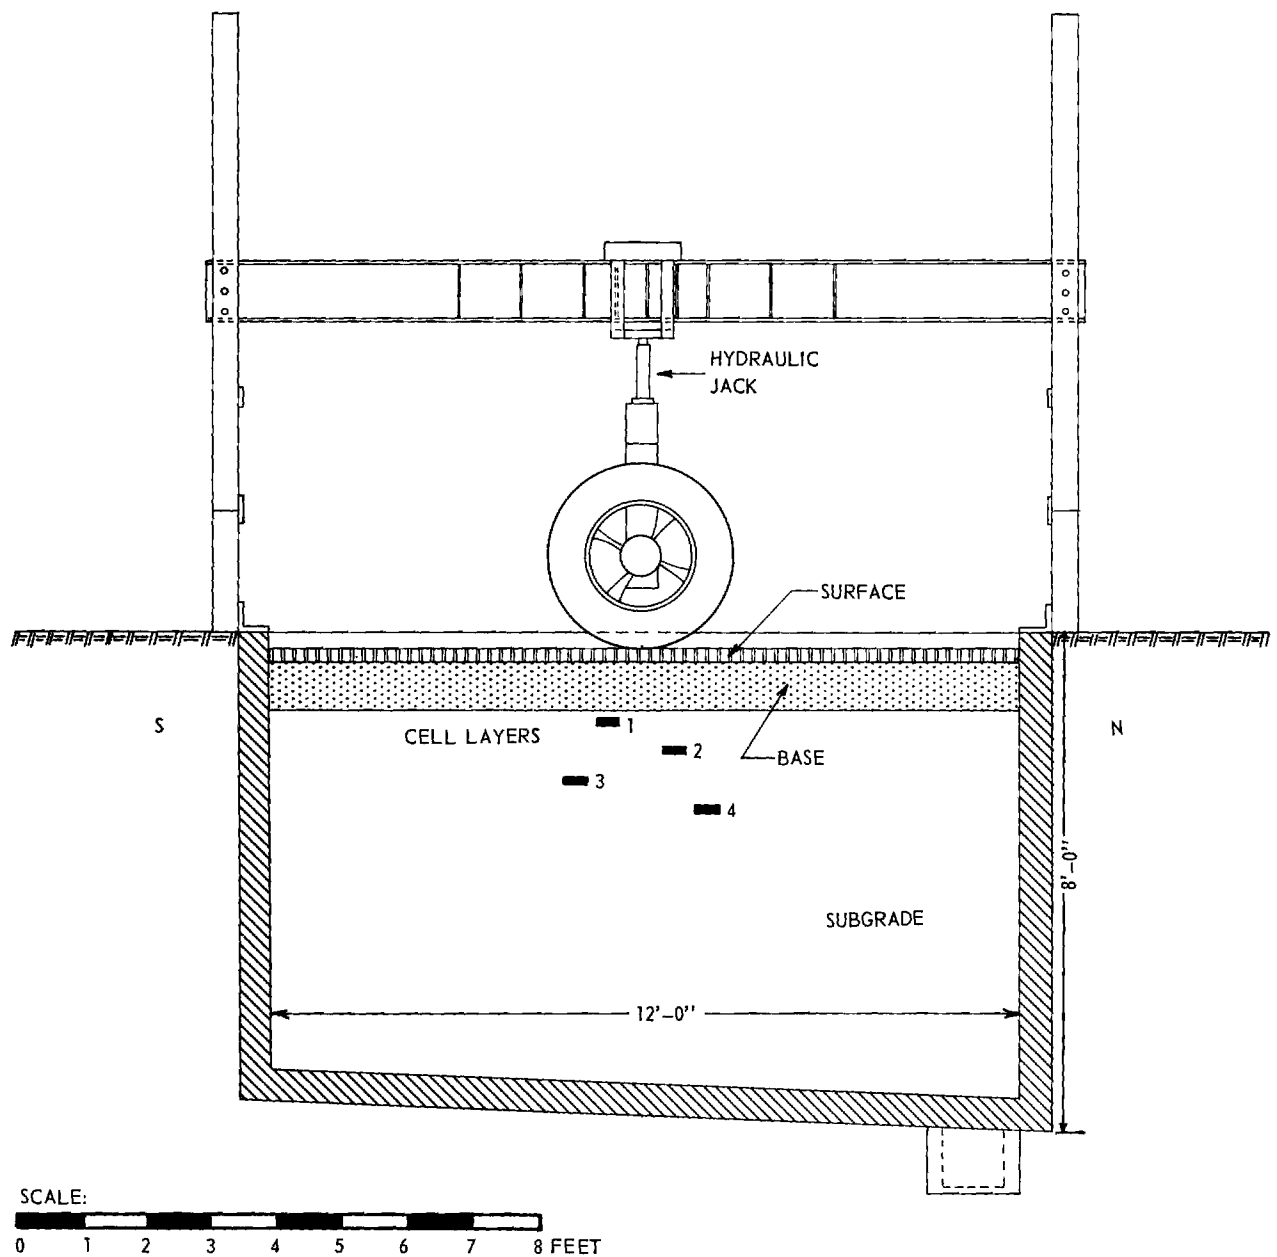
Cross-section of the test pit showing position of layers of pressure cells and the loading equipment.
